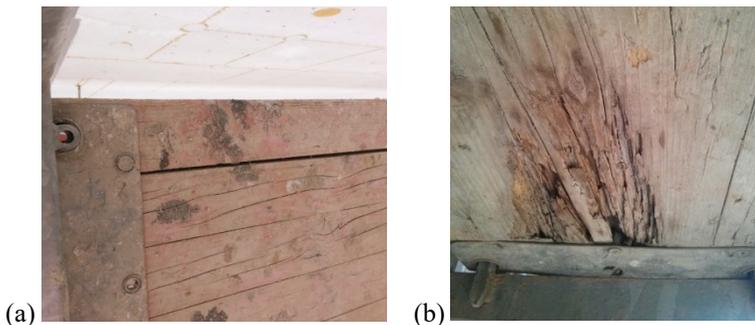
Damaged timber decks: (a) splitting of elements consisting the deck, (b) corrosion of timber.
